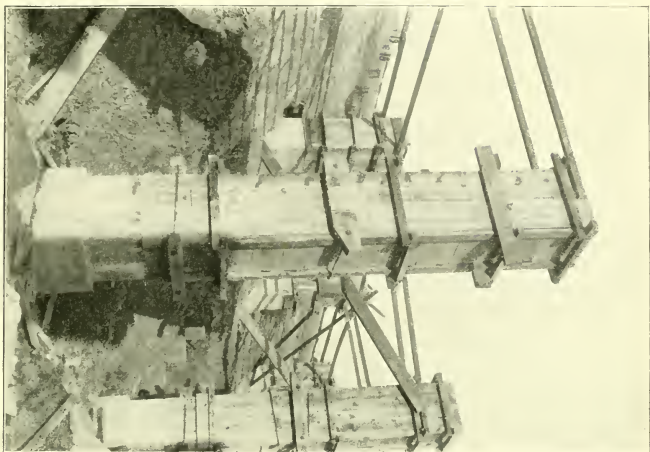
FORMS FOR UPPER SECTION OF PIERS.
